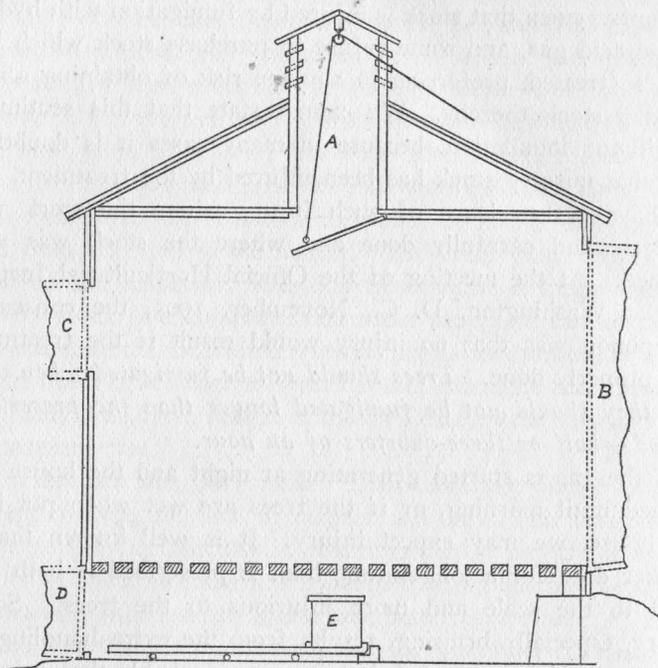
Diagram showing cross-section of a fumigating house 10 x 10 x 8 feet in size, with slat floor. A, ventilator that can be opened and closed from the outside; B, door where trees are carried in and out; C, small door opposite large one for ventilation; D, small door for communicating with generator; E, jar for generating the gas.
